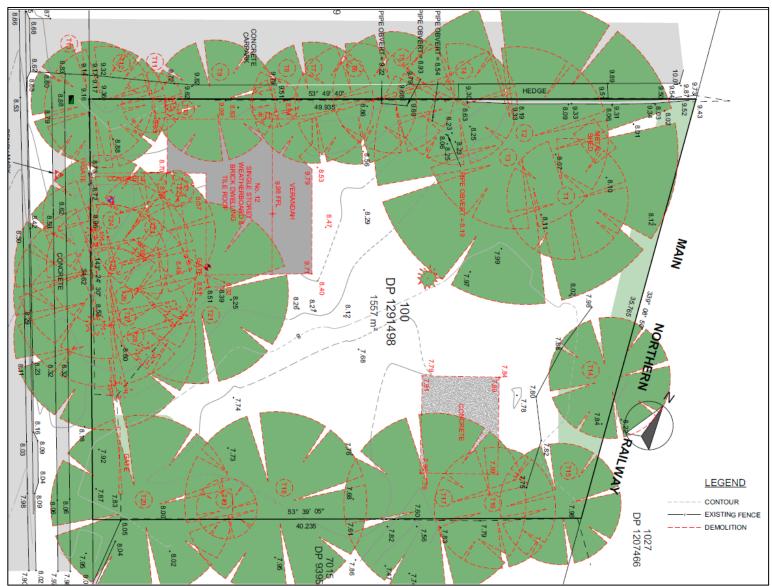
Proposed Demolition Plan (Source: Sorensen Design, 2023)
